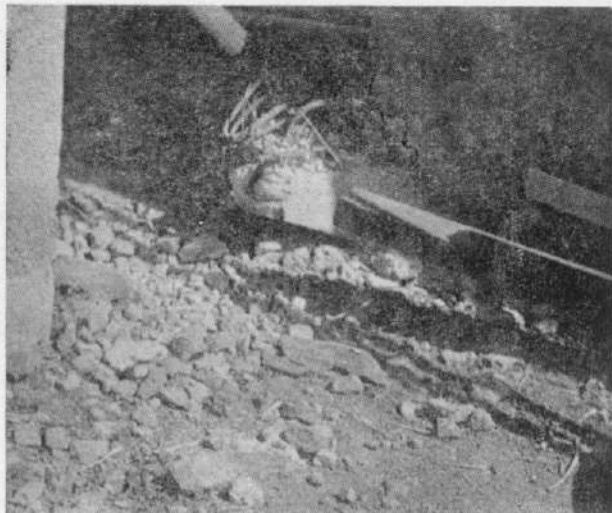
Buckling of reinforcements in the columns of water tank, badly mixed concrete and few reinforcements.
